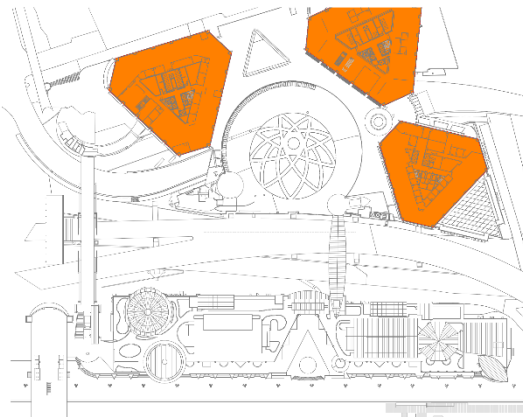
Proposed Landbridge Footprint with Beam Outlines
